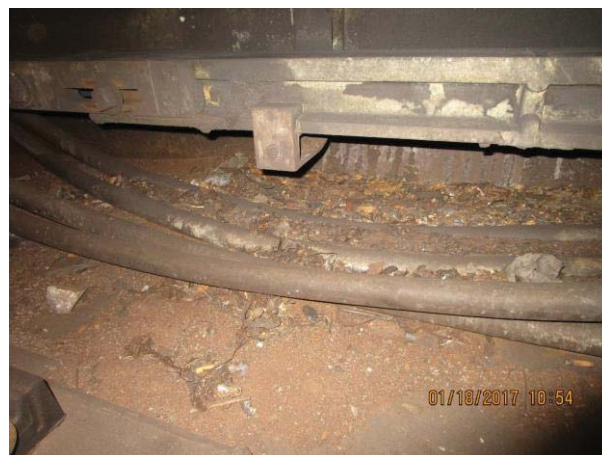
TRK 1 D02 – SMITHSONIAN PLATFORM – EXPANSION CABLES ON DECK, DEBRIS SURROUNDING EXPANSION CABLES, CABLES ARE DEGRADED AND SHOULD BE REPLACED
